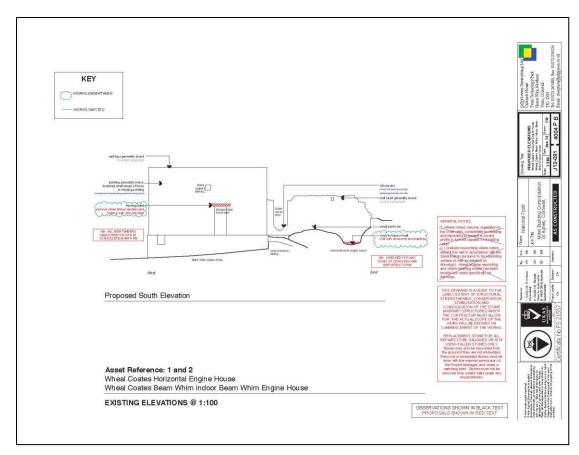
Southern external elevations of Wheal Coates horizontal engine house and beam whim.
